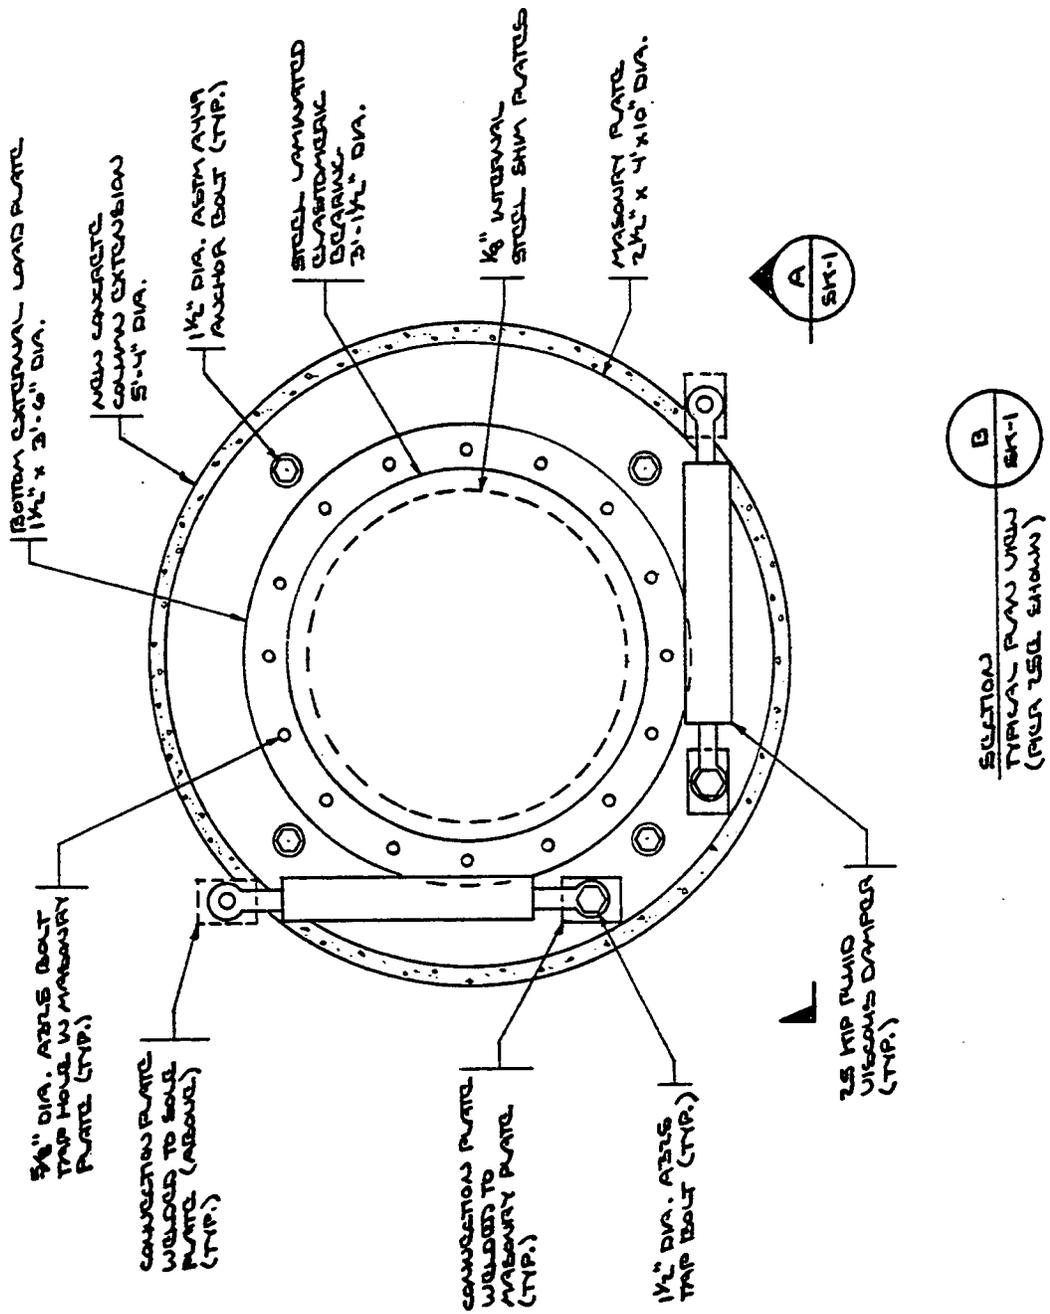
Martin Luther King Bridge, Plan View of Proposed Viscous Fluid Damper System and Elastomeric Bearing
